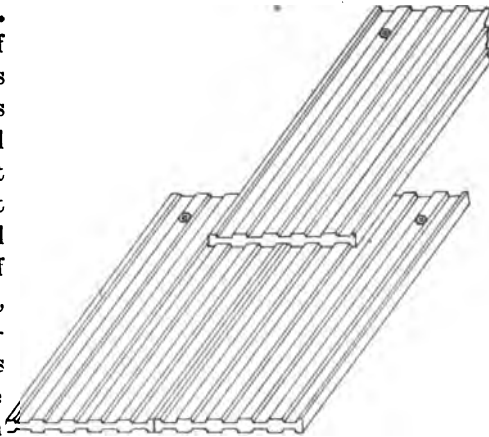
New Lexington Auger-made Interlocking Tiles.
